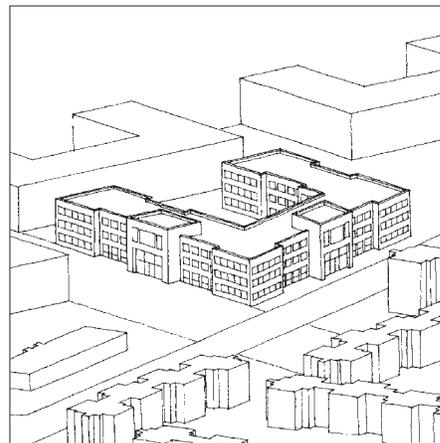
illustrates educational and residential site planning principles for the CSUMB campus. The site planning principles apply to both new and renovated construction. By siting buildings relative to the streets and the open space system, the buildings demarcate edges and reinforce the surrounding spaces. Using the buildings to demarcate edges forms the structure for the campus, emphasizing activated areas along the streets and open space spines. The buildings are thus used as space defining elements rather than space occupying elements, allowing the open spaces and streets to play a greater role in forming community areas for the campus.
